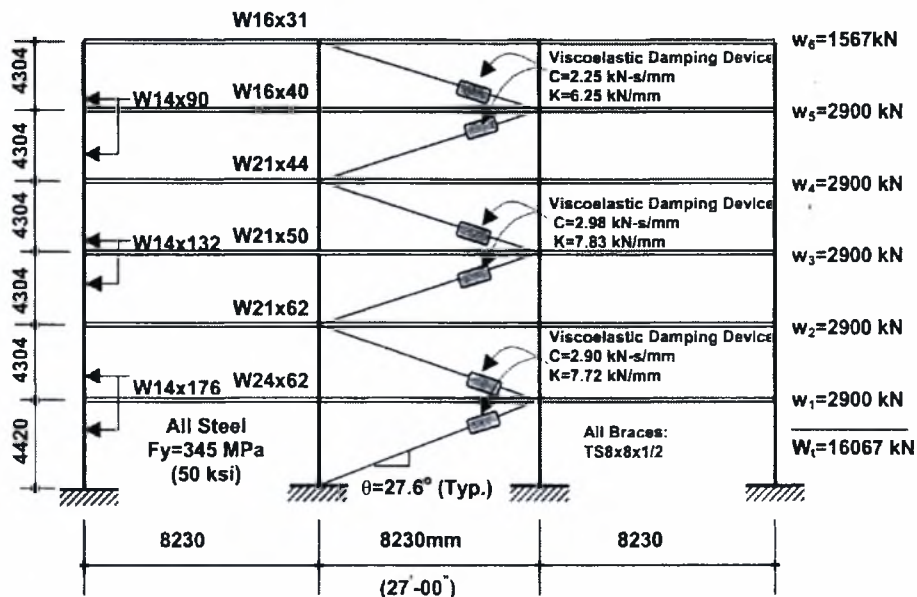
(c) 6- story building equipped with linear viscous dampers
